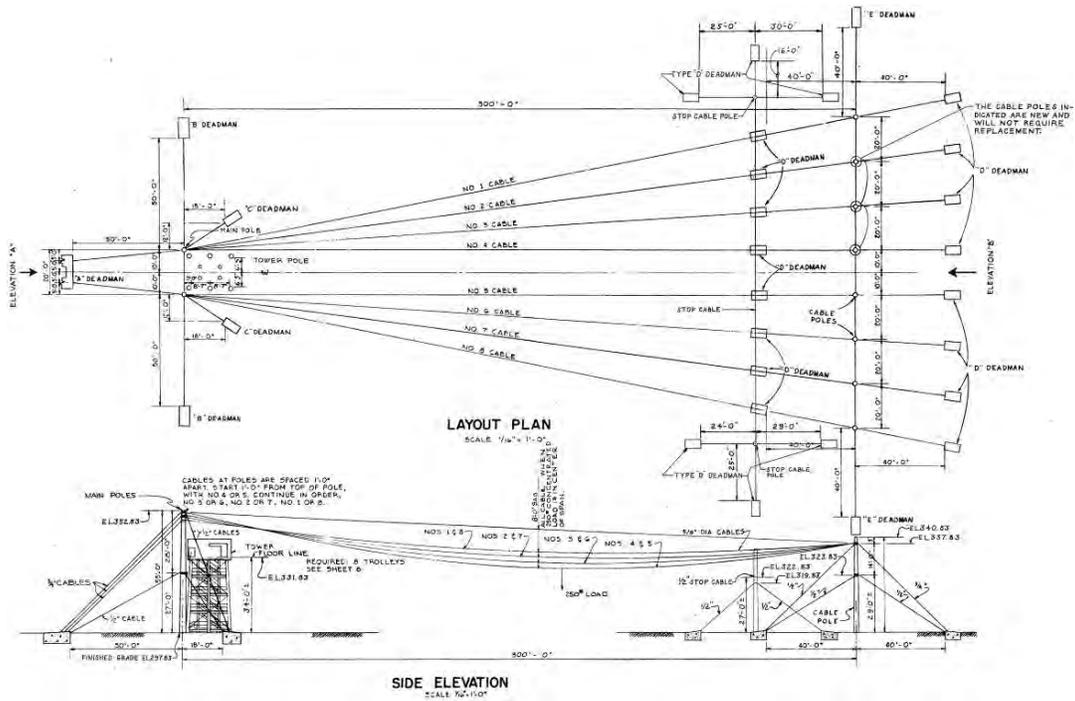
Mock-up tower for airborne training, layout plan and side elevation, Fort Bragg, NC, 1952 (standard drawing 28-13-59 sheet 1 of 6; mock-up tower for airborne training, layout plan and elevations; 11 April 1952).
